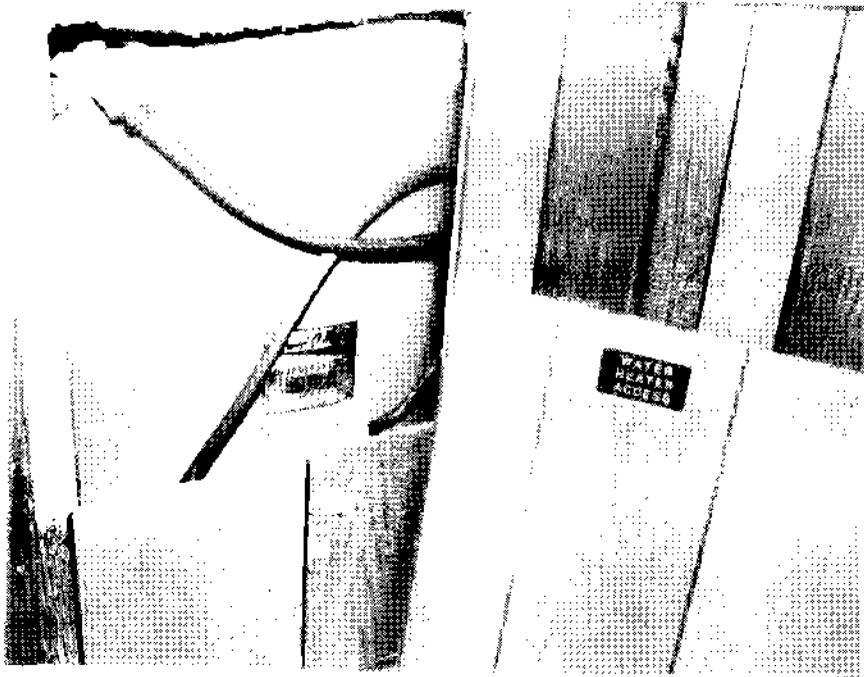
Inadequate Hot Water Heater Access From Within Closet. Wall Paneling Would Have to be Removed to Replace Hot Water Heater
